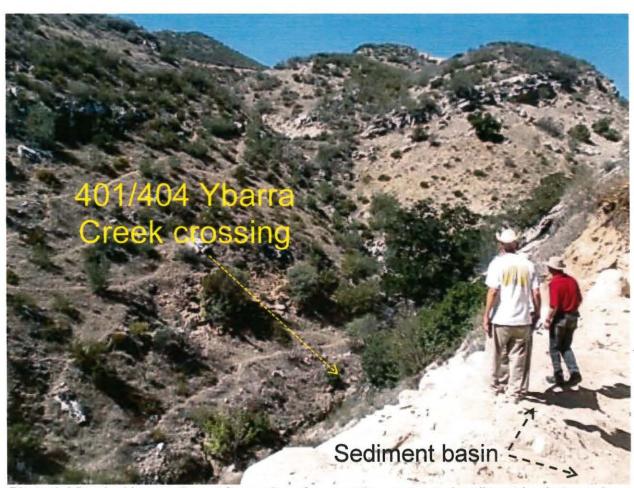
View looking southwest from edge of a recently constructed sediment basin towards Ybarra Creek in the area of a proposed bridge crossing of Ybarra Creek.
